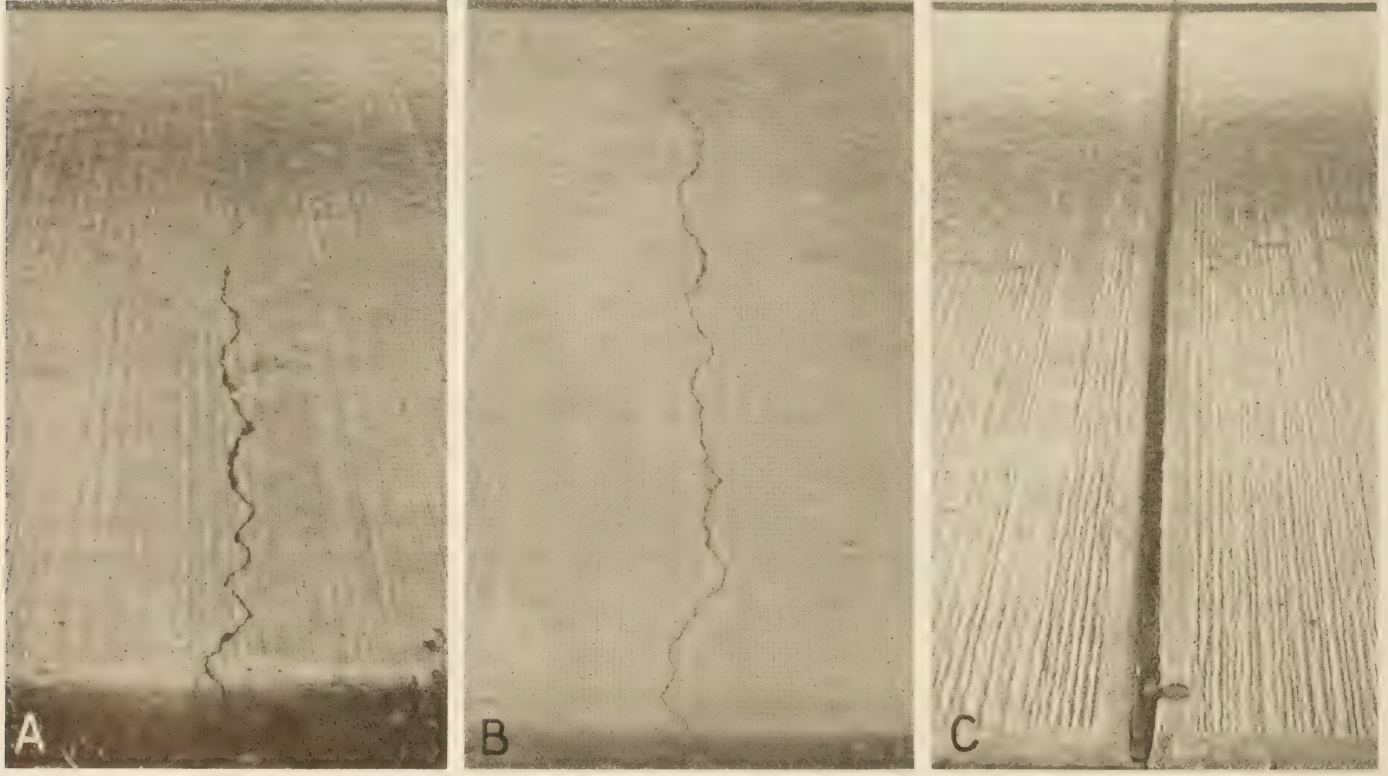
A, TYPICAL CRACK OVER SUBMERGED PARTING STRIP IN LANE CARRYING HEAVY TRAFFIC; B, TYPICAL CRACK OVER SUBMERGED PARTING STRIP IN LANE CARRYING LIGHT TRAFFIC; C, PRESENT CONDITION OF TYPICAL WEAKENED-PLANE JOINT WITH SURFACE GROOVE.
